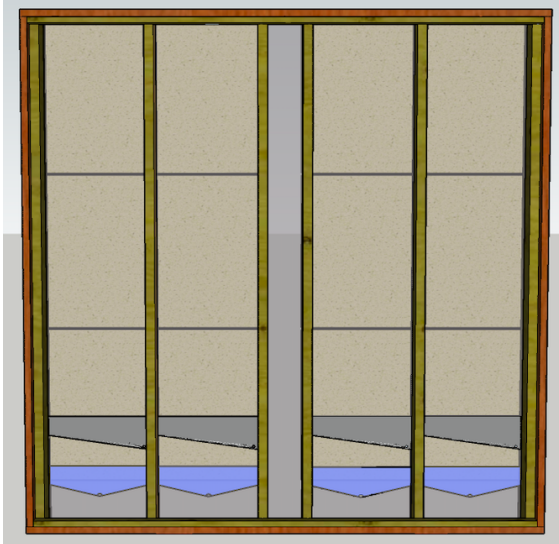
Test rig from the interior side. Left side is test section 1, and right side is test section 2. Both the aluminium and plastic gutters can be seen.
